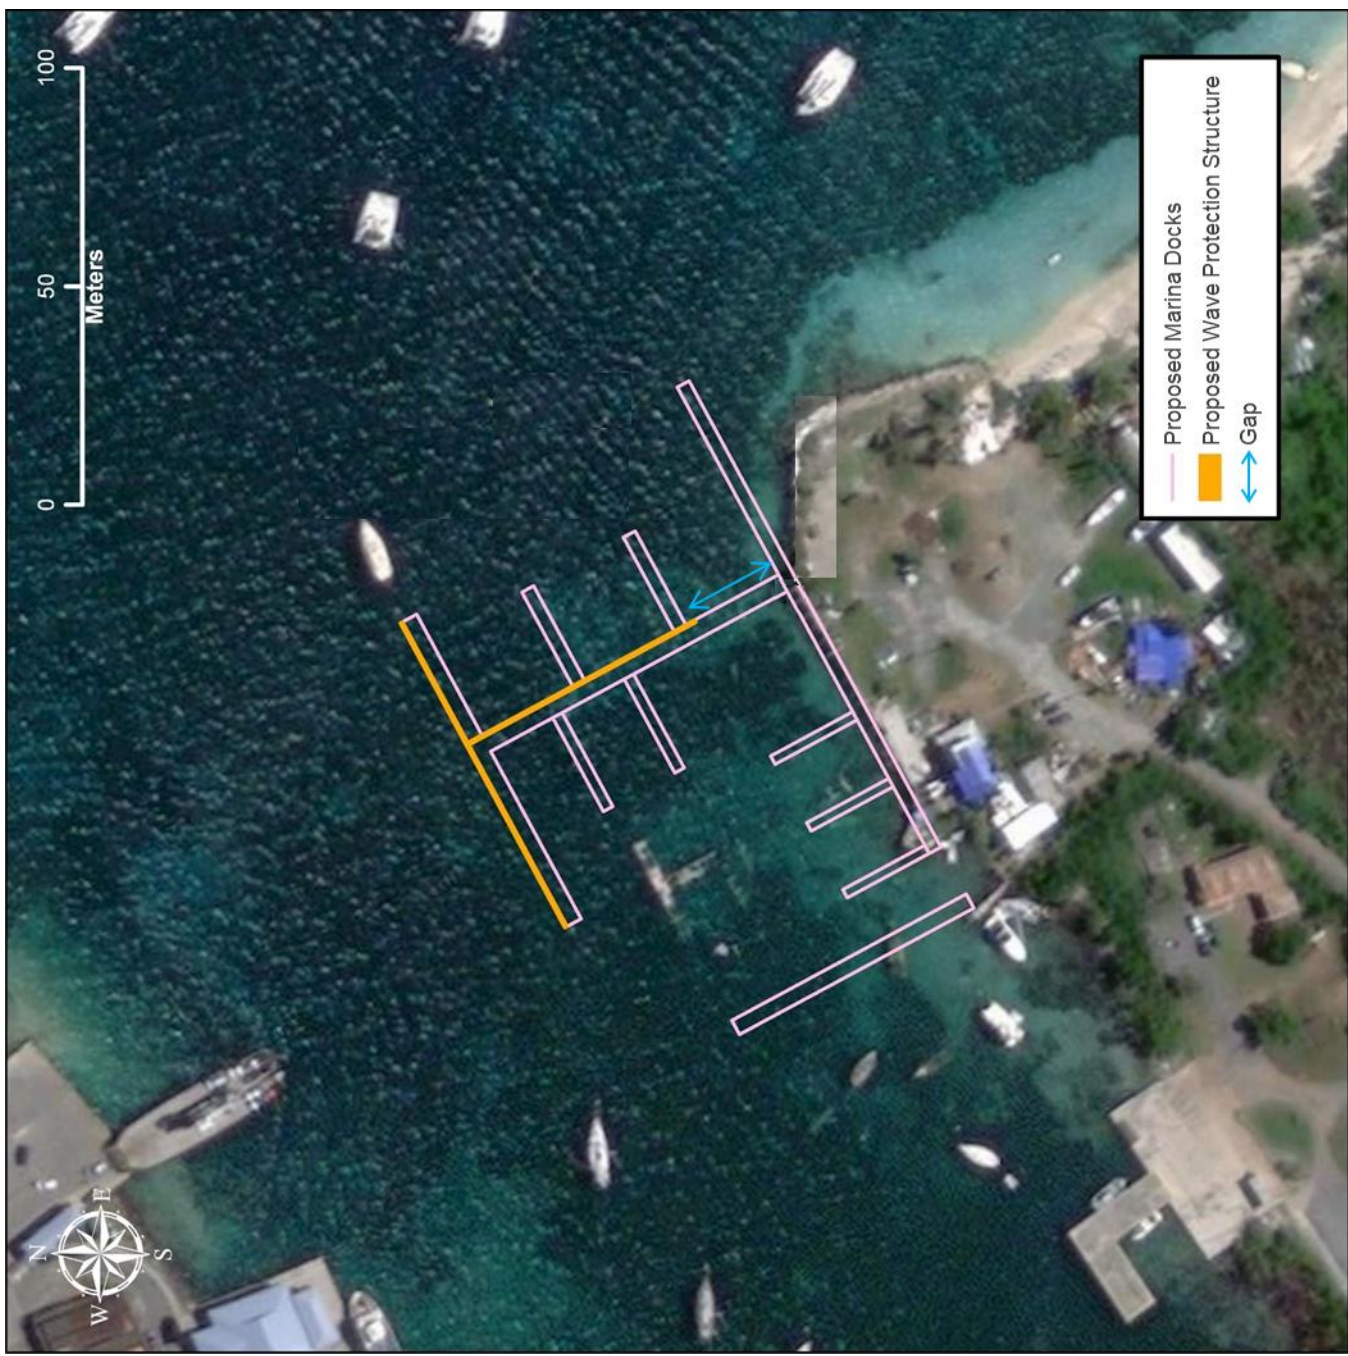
Vessup Point Plan View with Proposed Marina Location and Wave Protection Structure (Design Condition)
